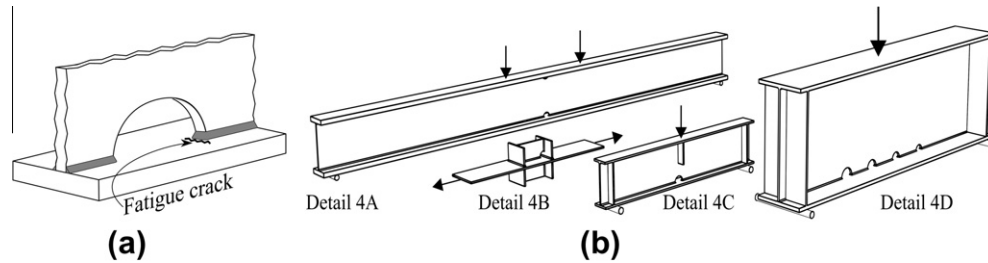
(a) Fatigue crack location in specimens with cope holes; (b) different cope-hole test configurations.
